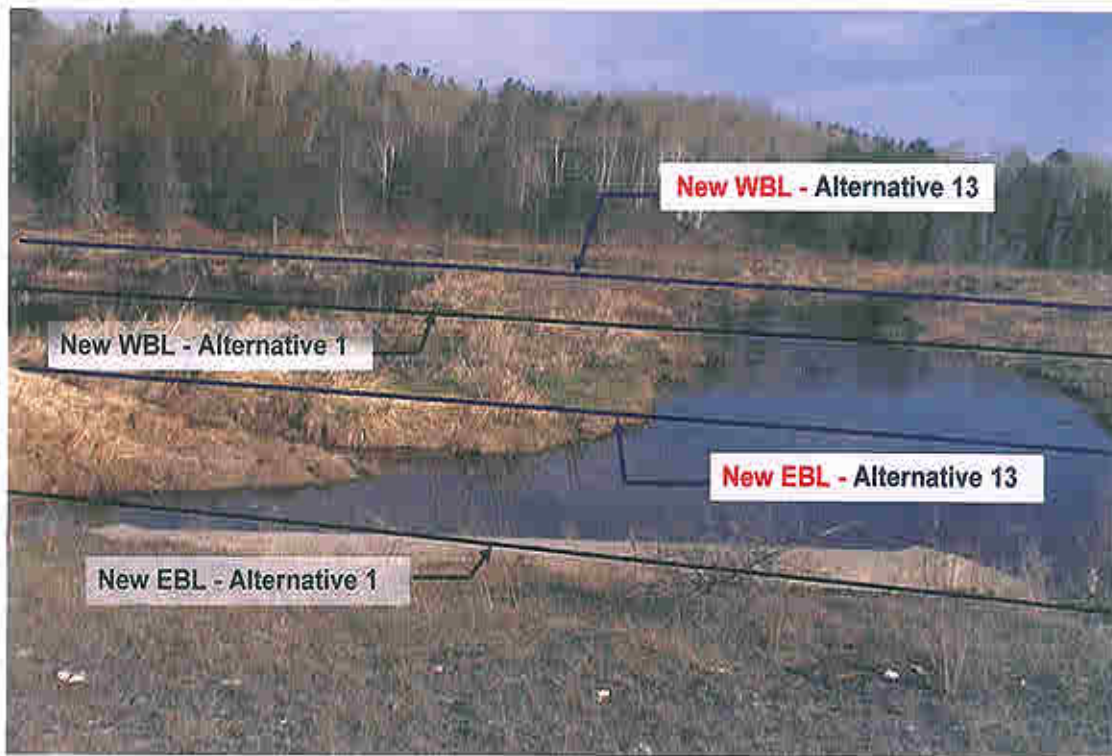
VIEW: Looking east from west side of SMR 55 at about 300 m south of SMR 55 intersection with Lindala Road. (September 12, 2006)
